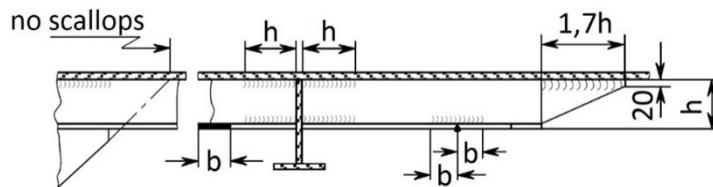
Welds at the ends of girders and stiffeners
